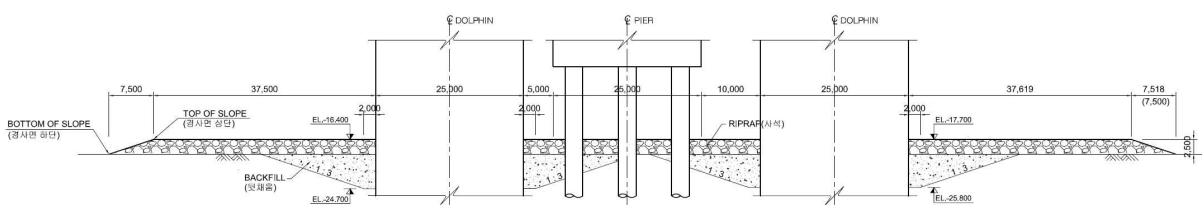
Cross-section of the riprap protection around the pier and dolphins
